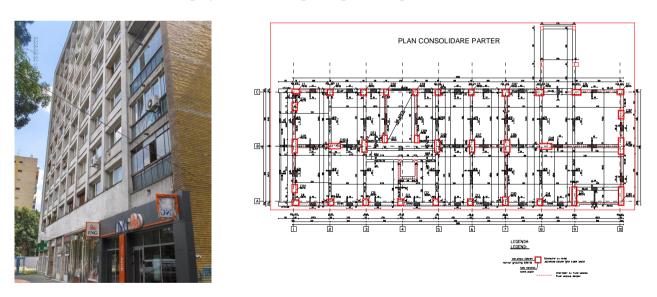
Soft and weak groundfloor RC building built in 1960's and retrofitting solution
